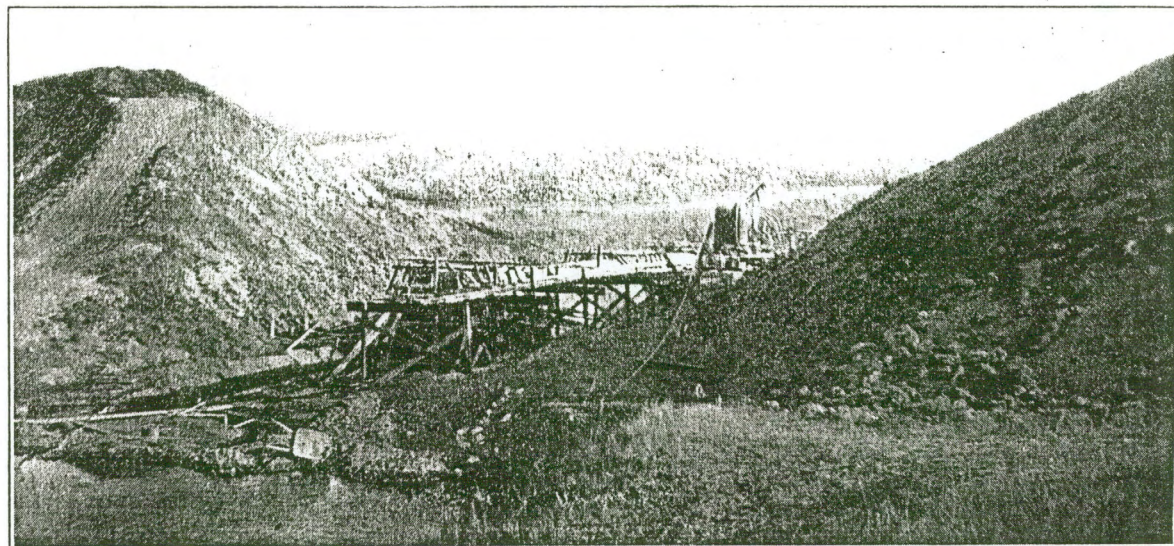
Construction of 16-ft. Arch Culvert at Squaw Coulee.
